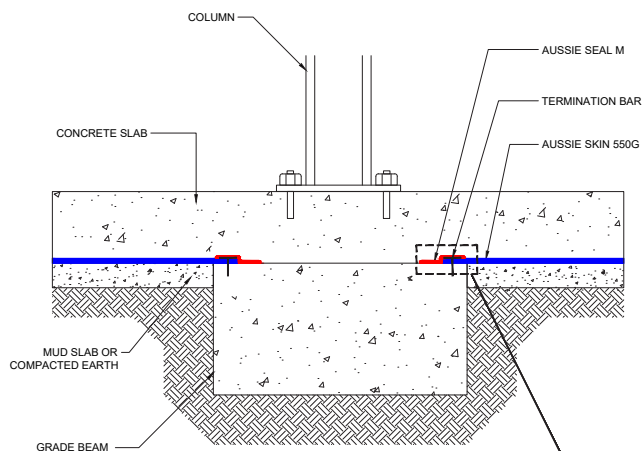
GRADE BEAM NON-HYDROSTATIC DETAIL
